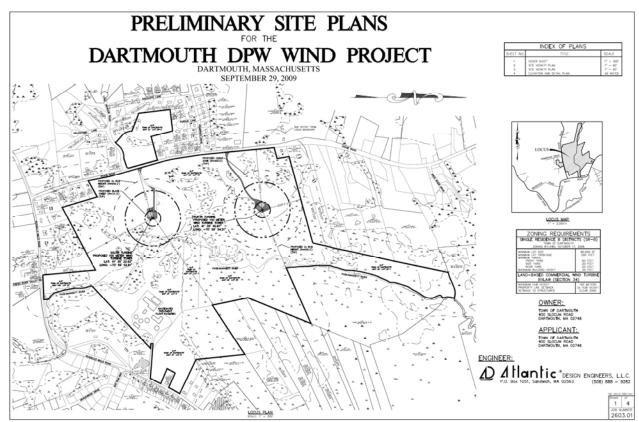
New locations for north and south turbines on DPW property at 687 Chase Road.
